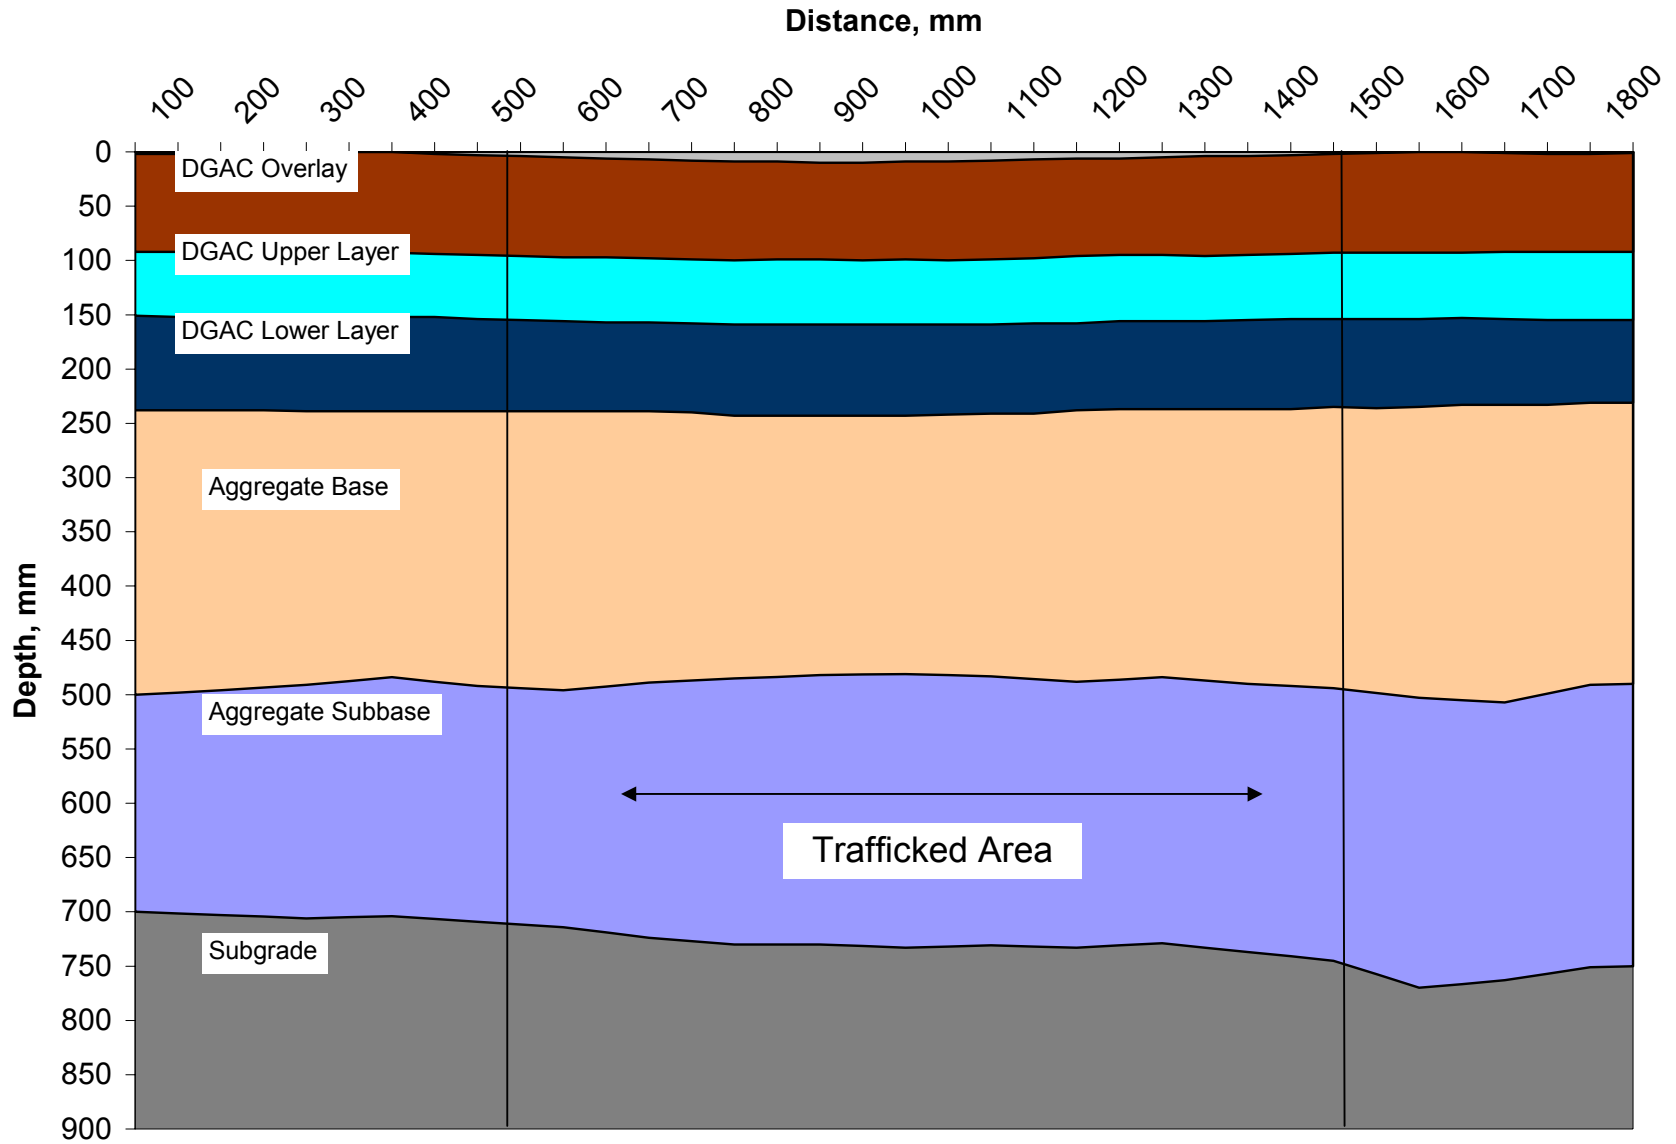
Trench data, north face of trench at Station 9, Section 545.
